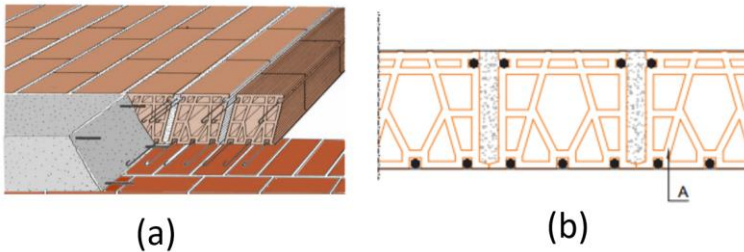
a) detail between S.A.P and concrete curb; b) cross section of S.A.P. ([www.leca.it](http://www.leca.it))
